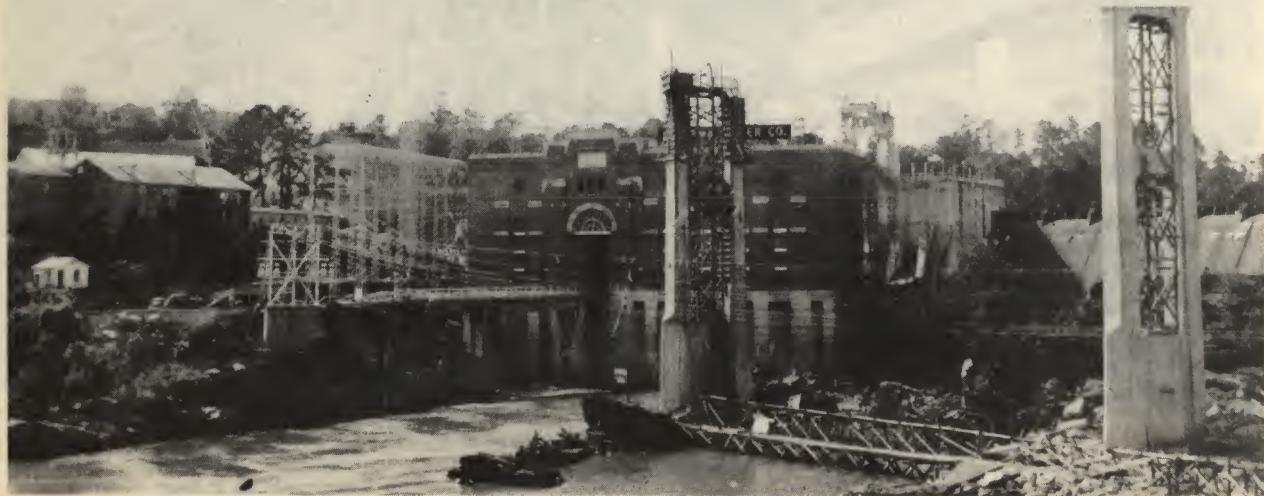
107 foot riser pipe running up form tower on Tallassee Bridge.
